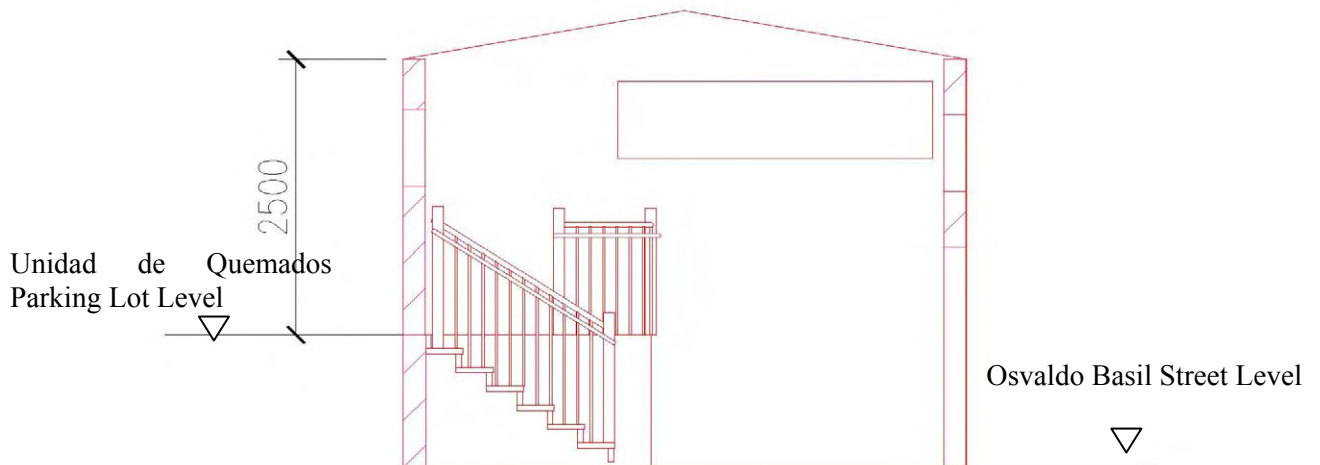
Section Showing Walls and Floor Elevation (in mm)
